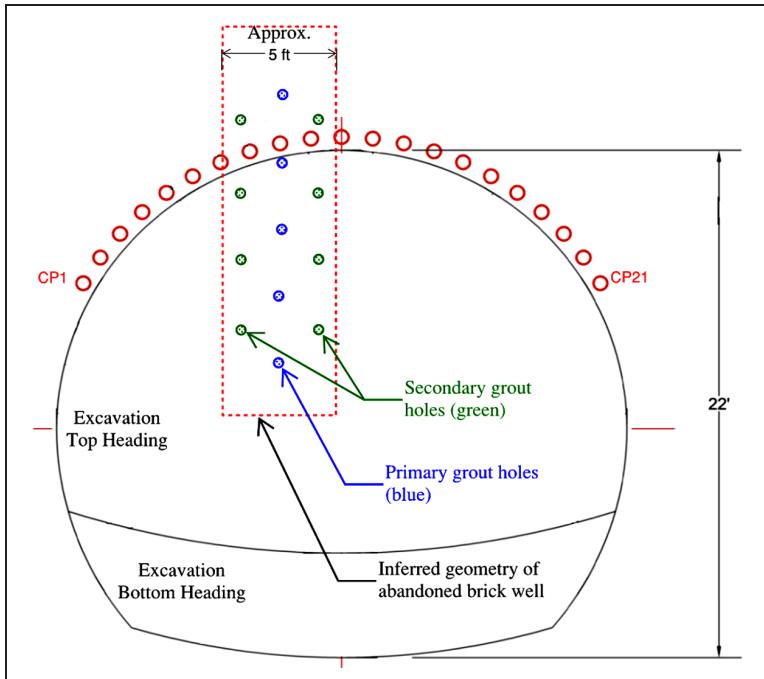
Simplified layout of abandoned brick well grouting campaign with canopy pipe (CP) layout included
